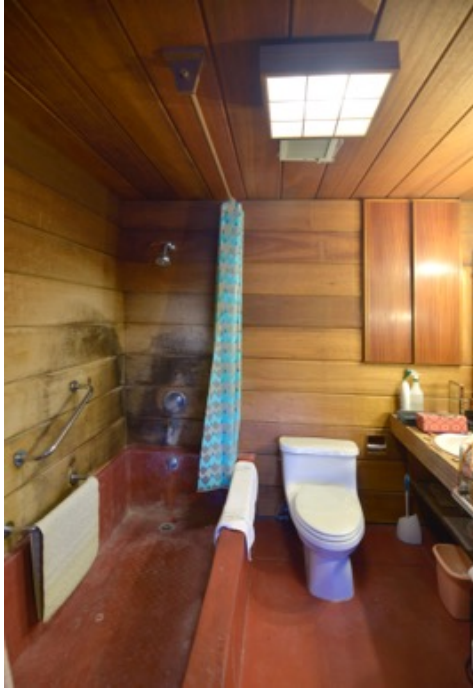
View of master bathroom showing red concrete tub and floor, wood paneled walls and ceiling. Camera facing west.
